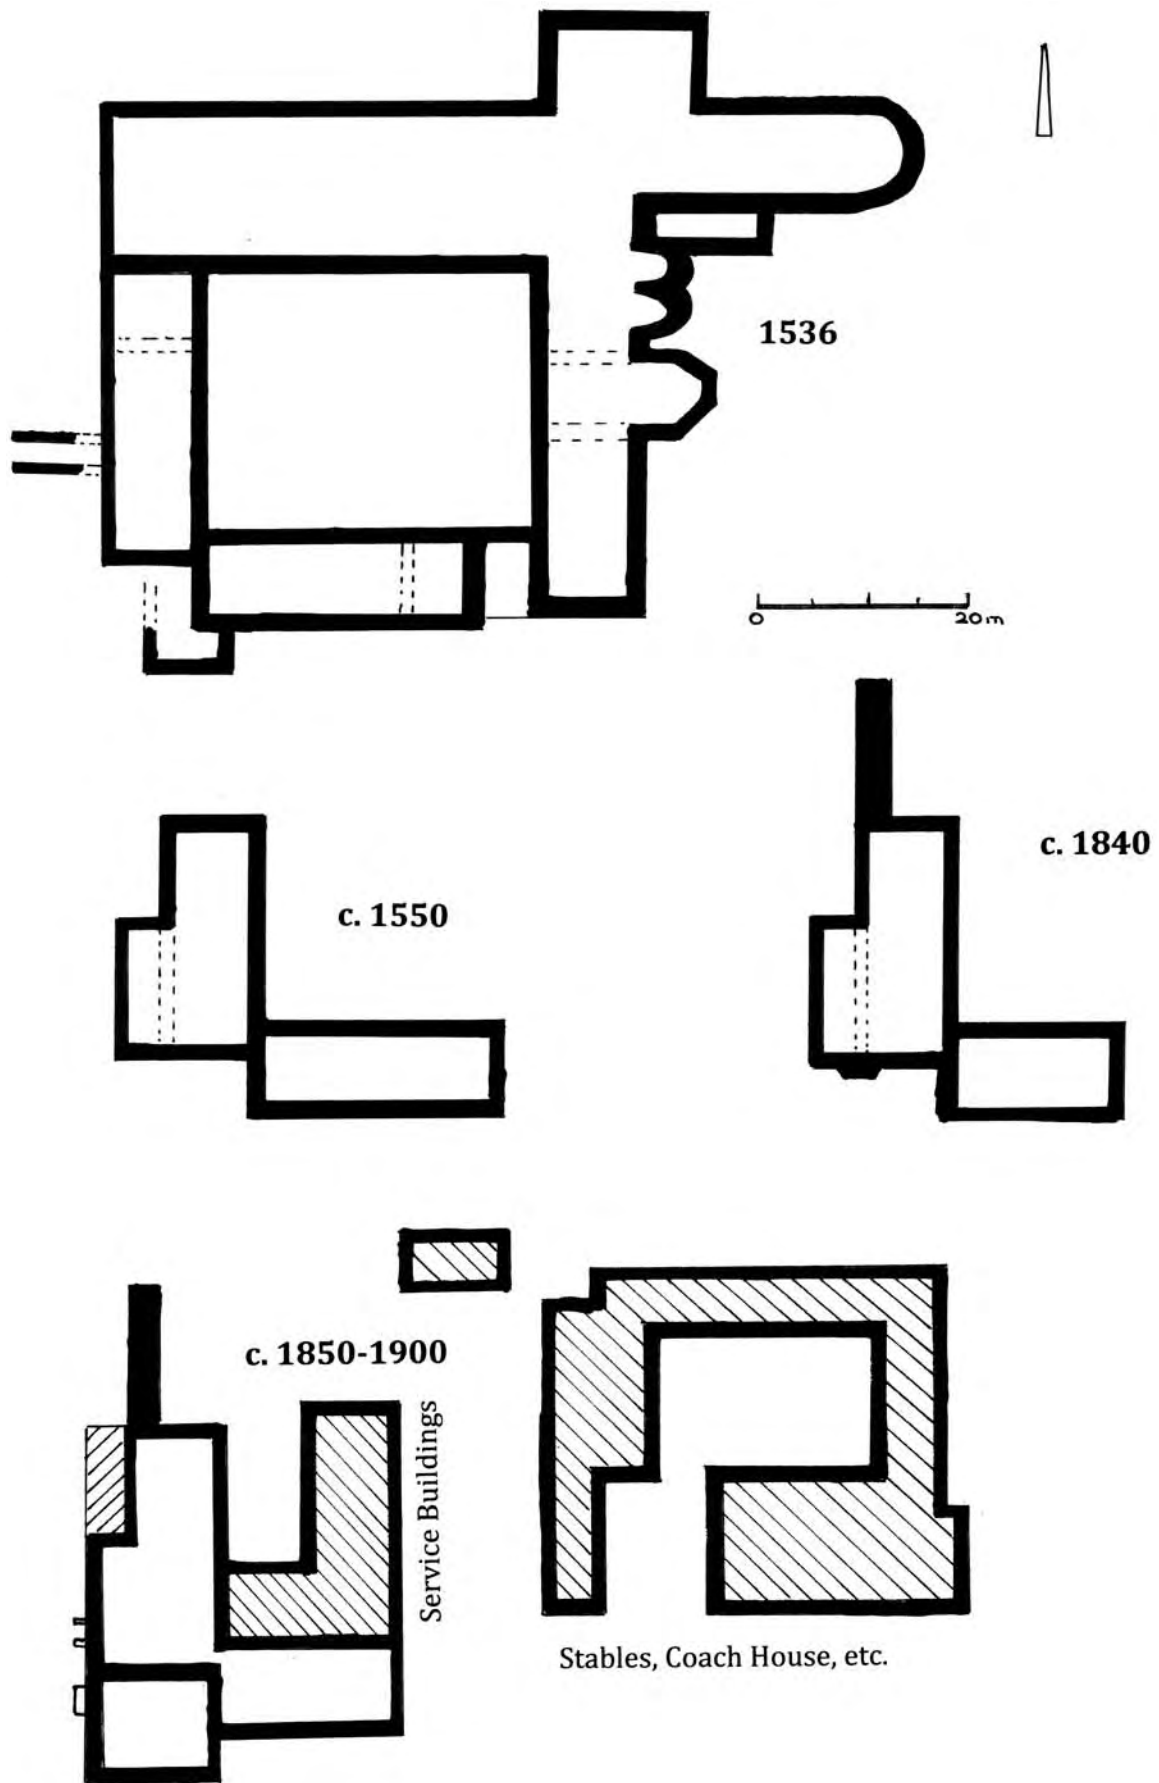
Plans showing Development of Prittlewell Priory, 1536–1900
